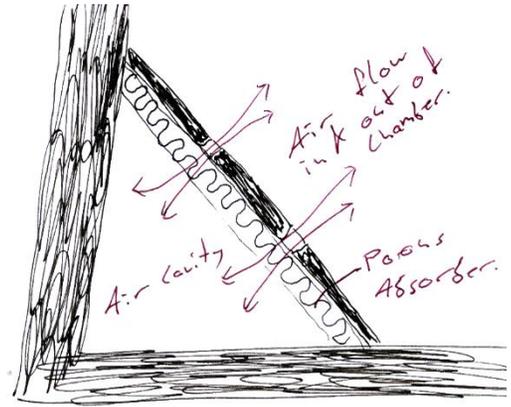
Helmholtz resonator/absorber constructed in a corner. This arrangement typically runs the whole height of the room. Plan drawing not in scale.
